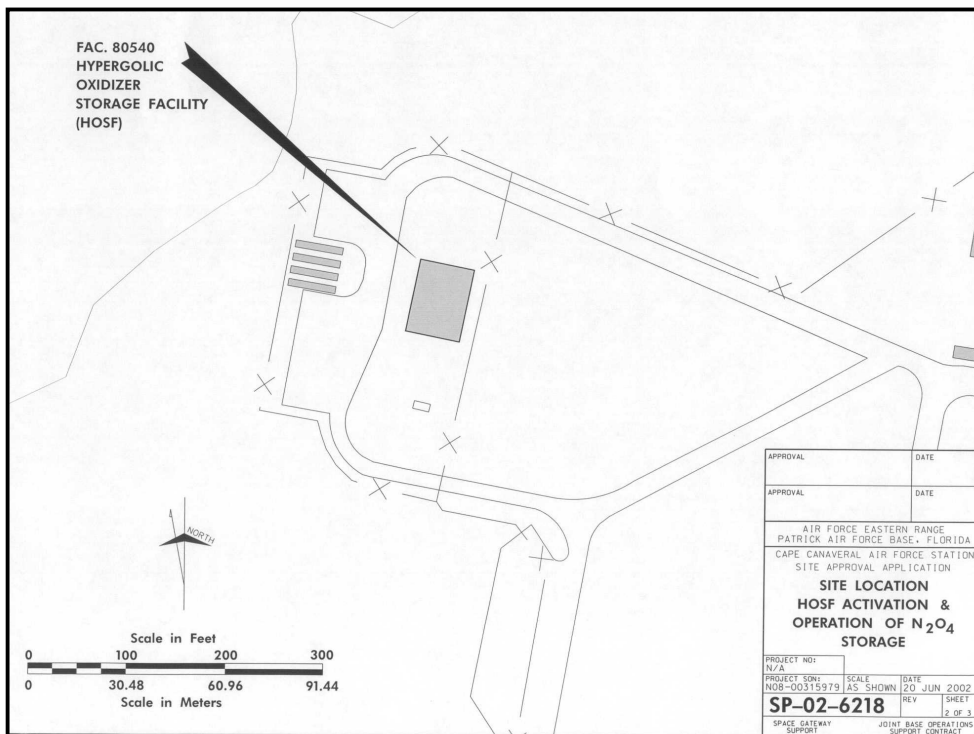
Site for proposed hypergolic oxidizer storage facility.
